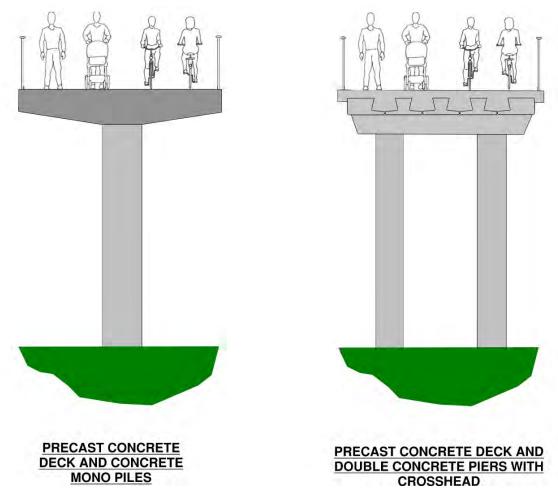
Indicative cross section for reinforced concrete structural forms for elevated ramp structure
